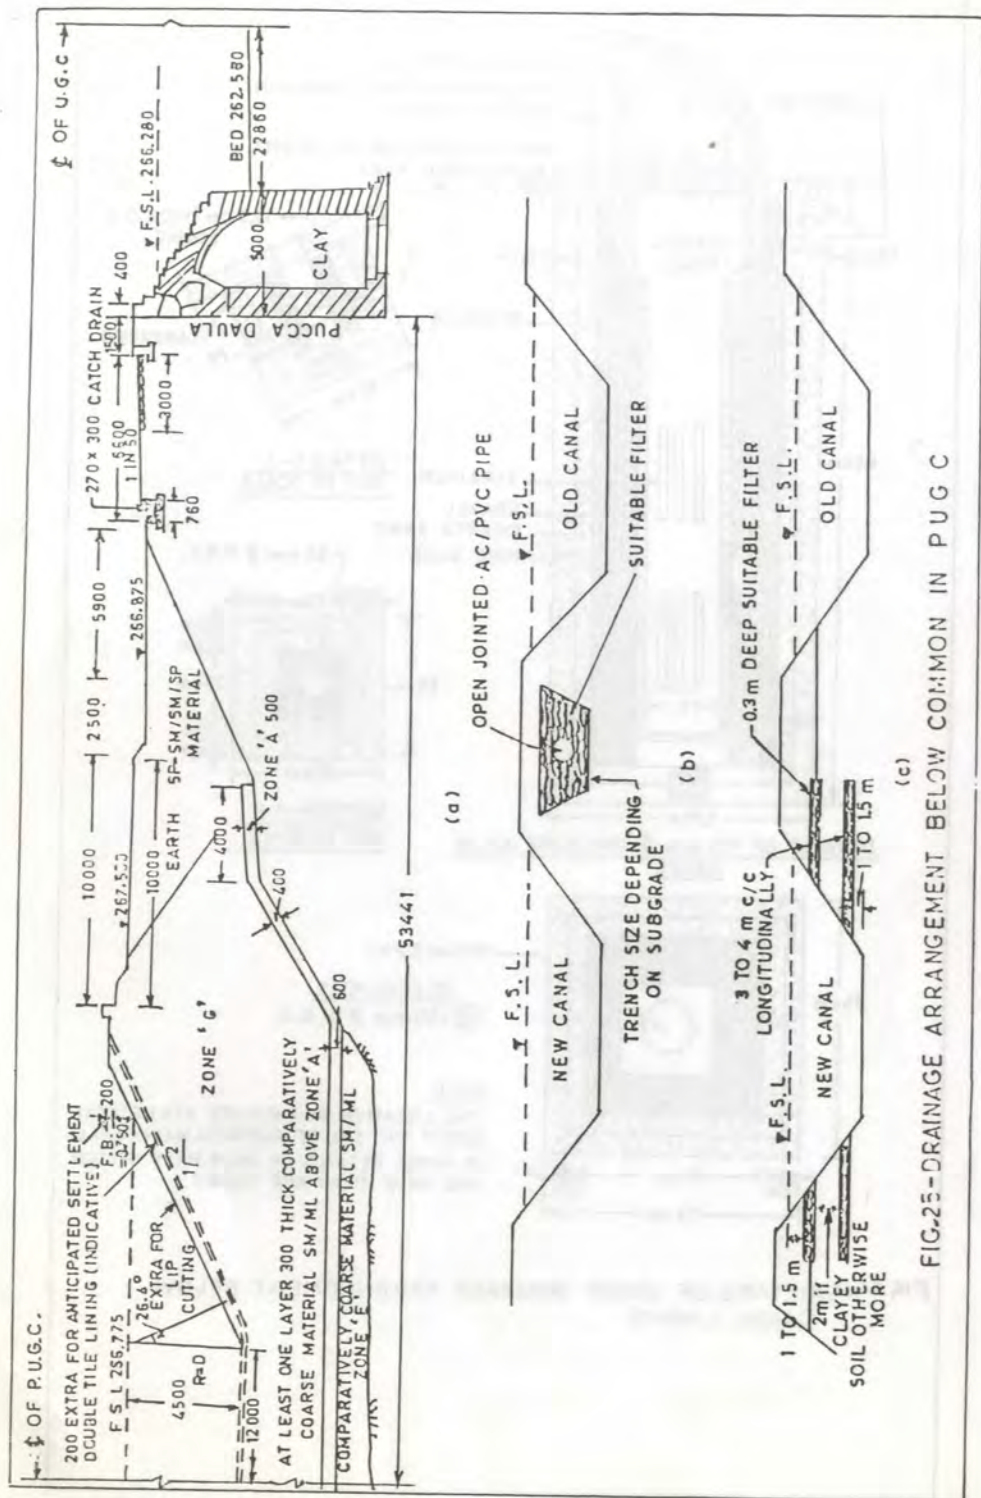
DRAINAGE ARRANGEMENT BELOW COMMON IN PUG C
